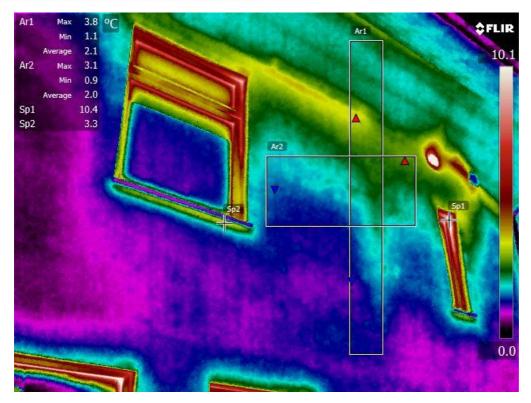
South upper elevation thermogram. Image shows heat loss through the upper part of the wall. The heating unit is located behind the wall at the right side of the narrow window.
